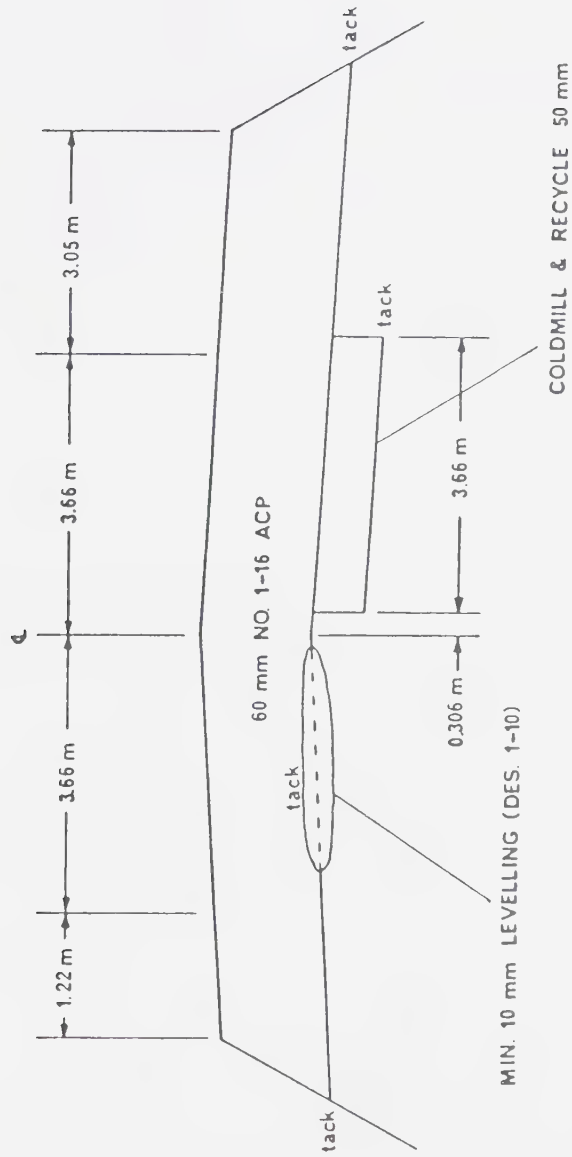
Typical cross-section - Project 2:18, 2:20
